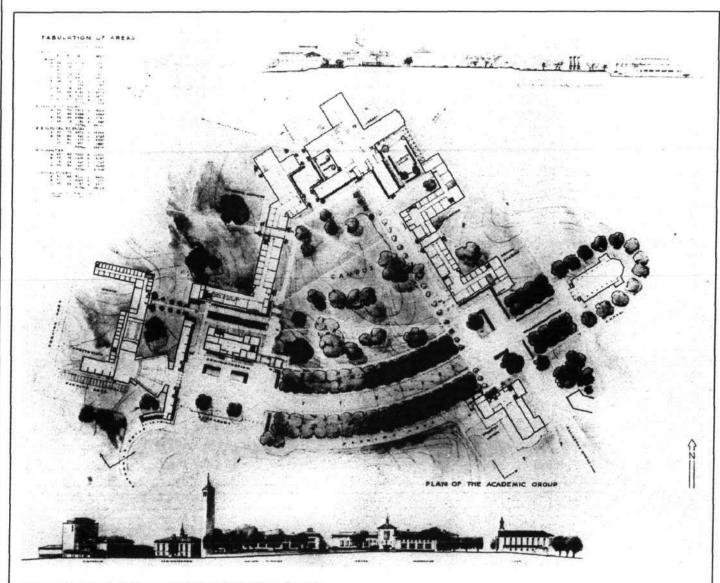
John C. B. Moore and Robert S. Hutchins, Campus Development Plan and Library, Goucher College, 1938. Plan and elevations of Academic Group. (Photo courtesy Goucher College.)
